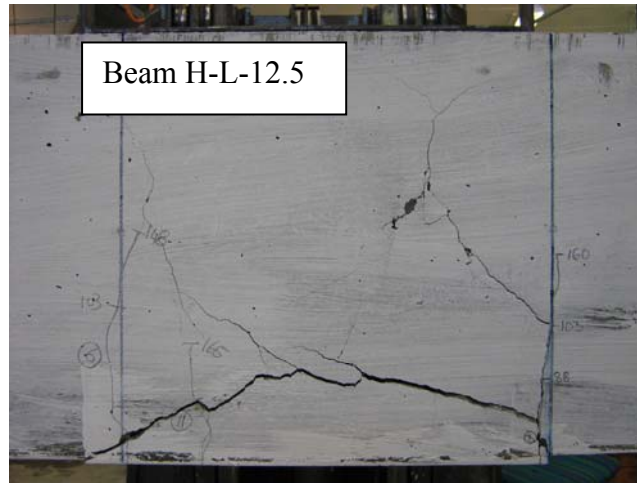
Crack Pattern of High Strength Geopolymer Concrete Beams over the Splice Region After Failure (L-Series)
